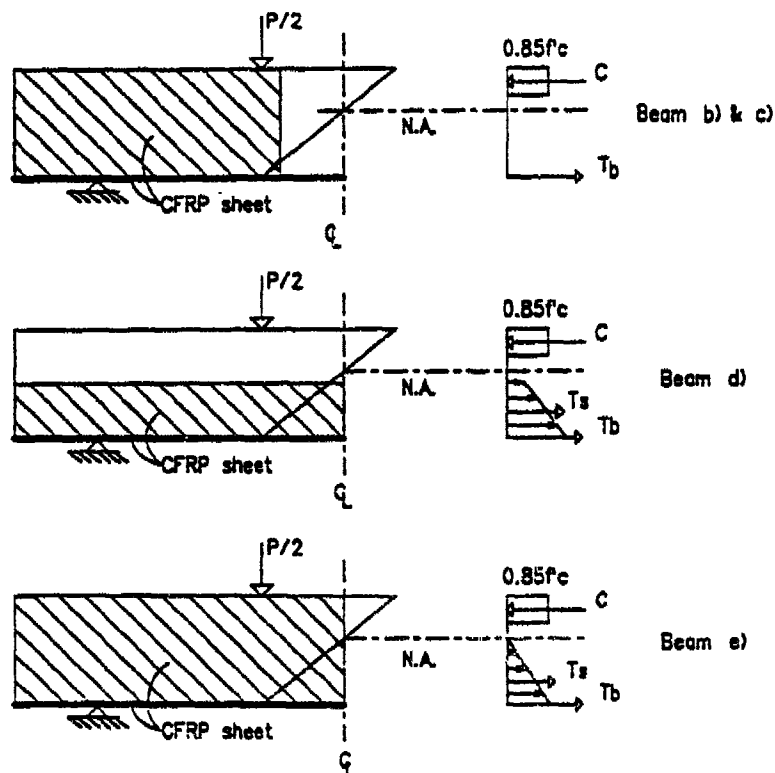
Lab Specimen Reinforcement Configurations and Loading Geometries.
